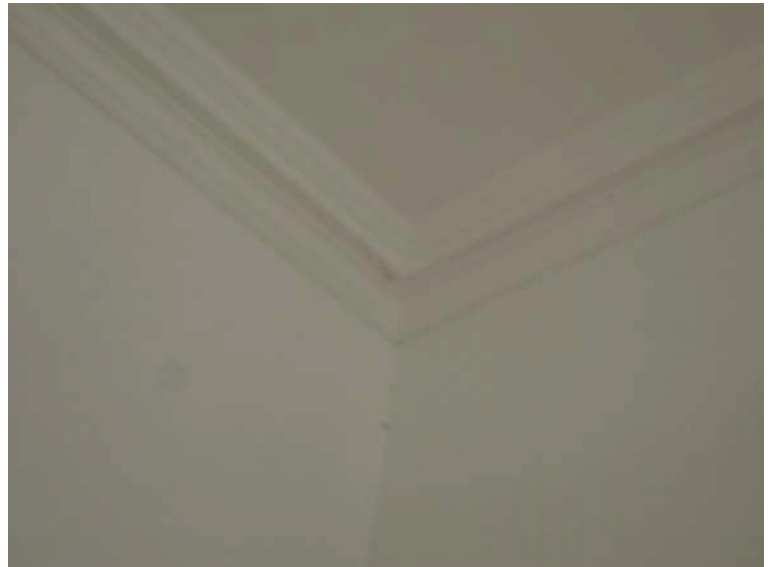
(left): Cornice detail in ground floor Room 15, viewed from the south-east
